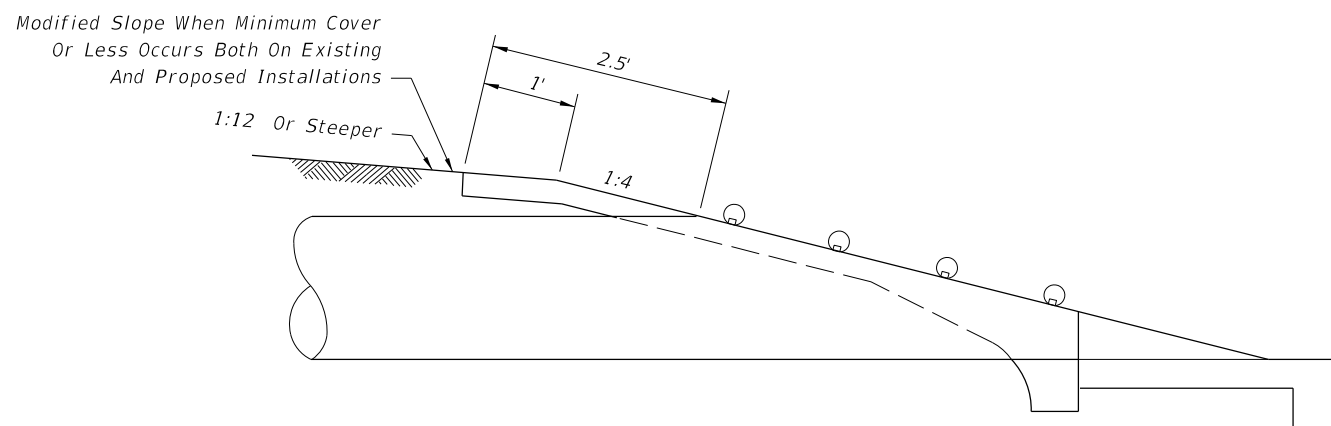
DETAILS FOR CONCRETE & CORRUGATED METAL PIPE
